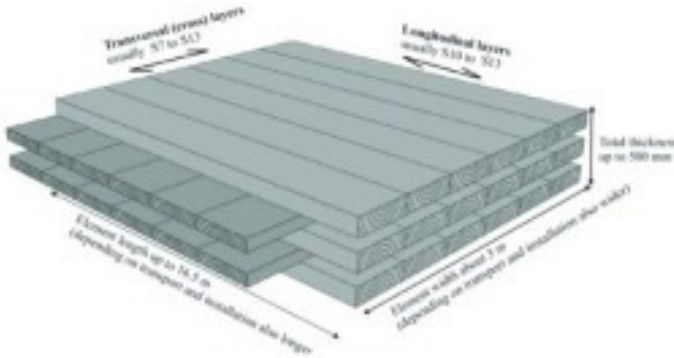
Cross-Laminated Timber (CLT) layered structural panel diagram.
